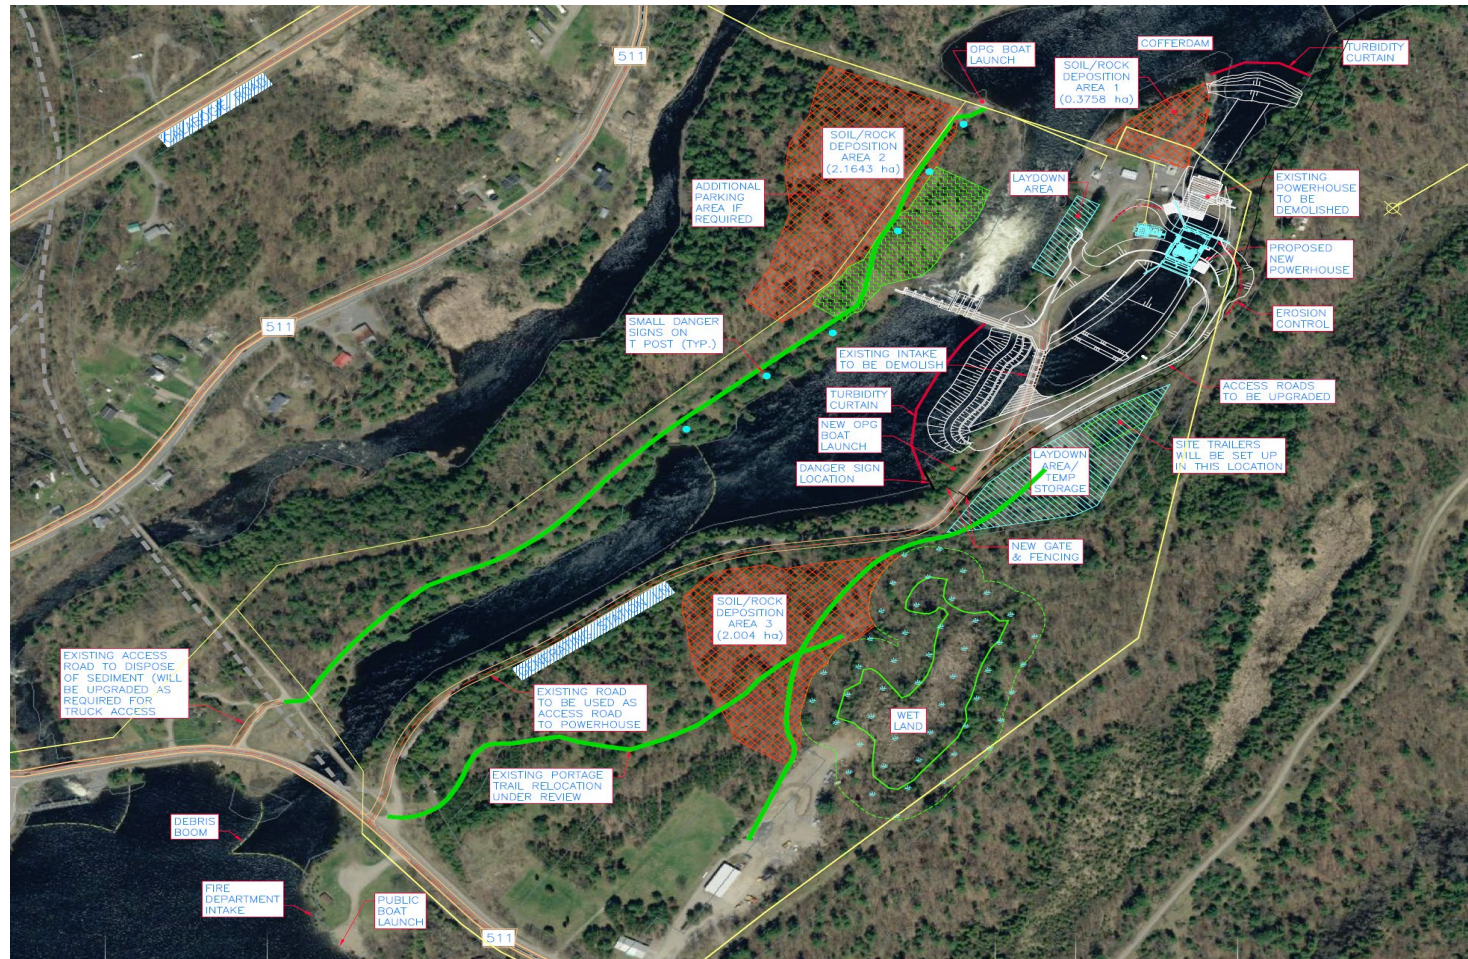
Proposed Powerhouse Arrangement for Calabogie
